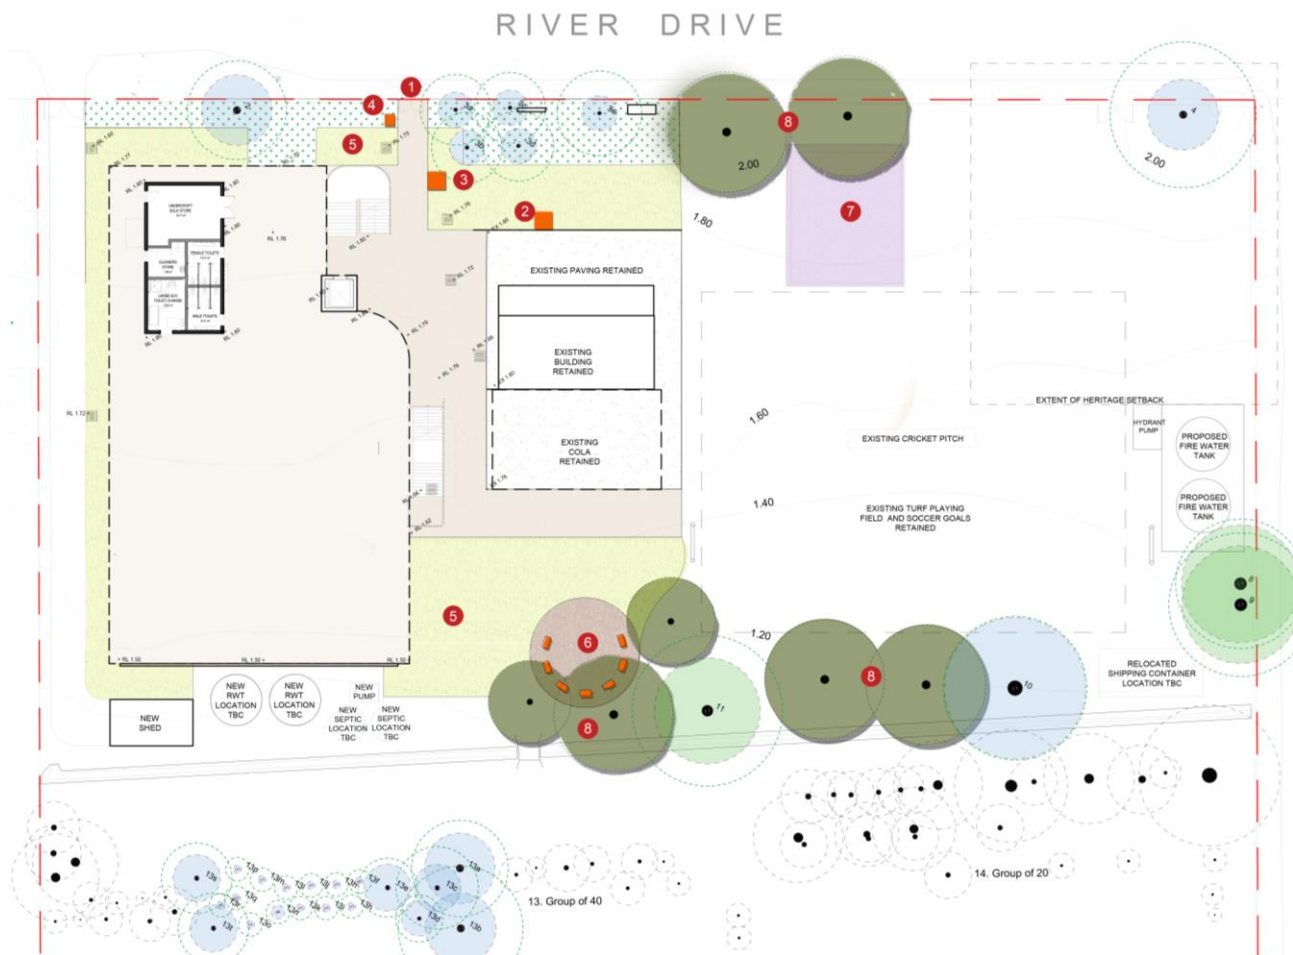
Proposed landscape plan (Source: Taylor Brammer Landscape Architects)
